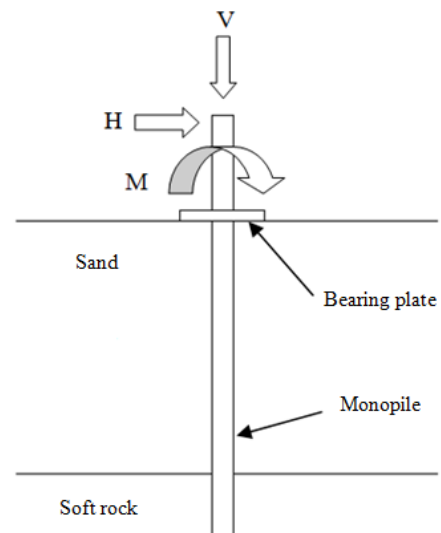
Schematic arrangement of monopile-footing with rock socketed pile.
